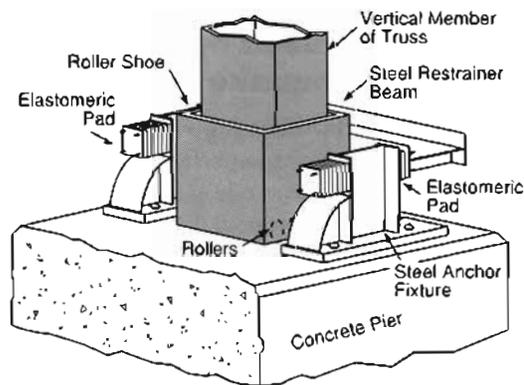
Restrainer retrofit installed on the expansion sides of Piers E17 through E22, rollers are at the base of the vertical member of the truss within the roller shoe.
